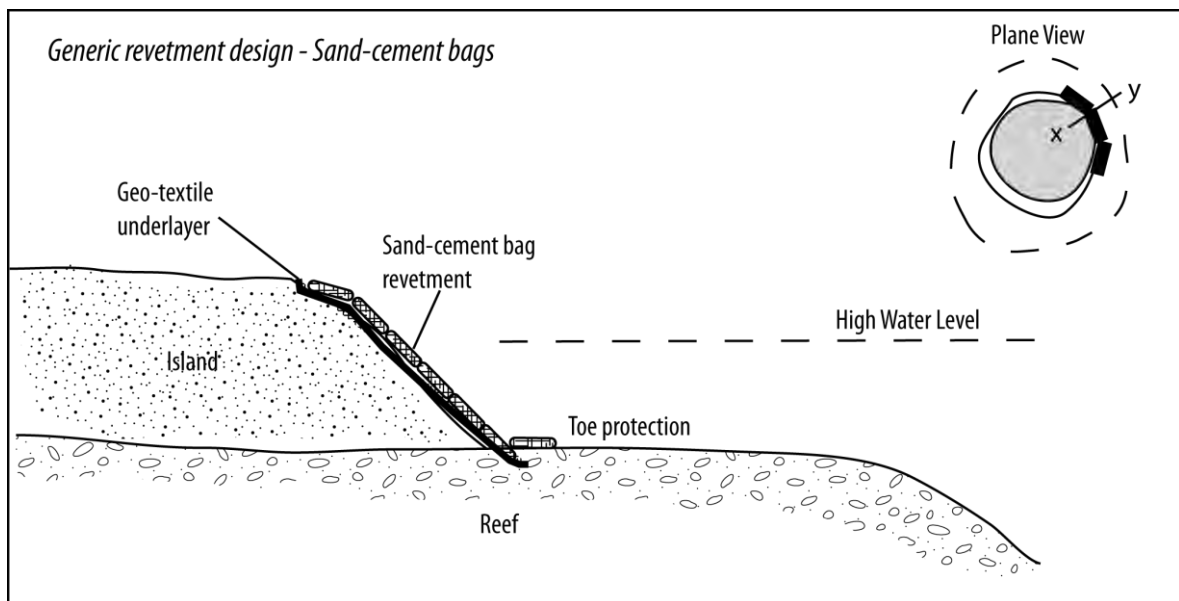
Cross-section of a proposed sand-cement bag revetment
